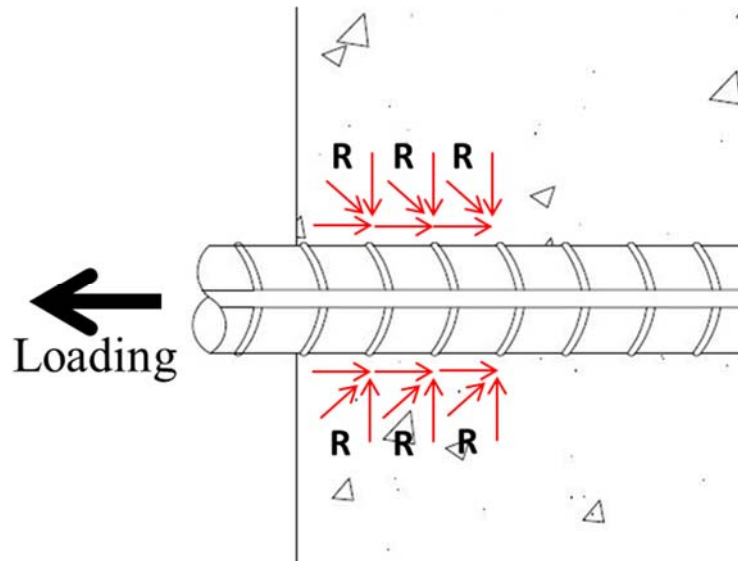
Idealized Reaction of Reinforcing Steel Embedded in Concrete, Subjected to Tension, Cross Sectional View
